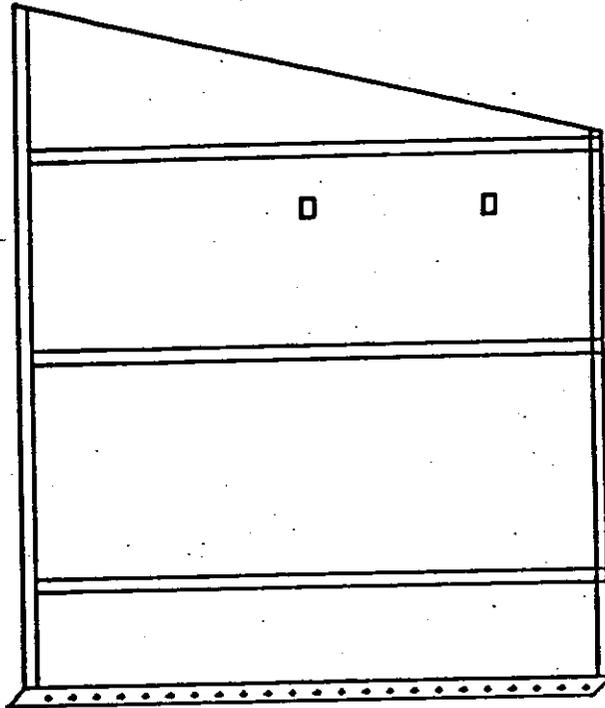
Building 8, Room B, West Wall – Areas Exceeding Guidelines
